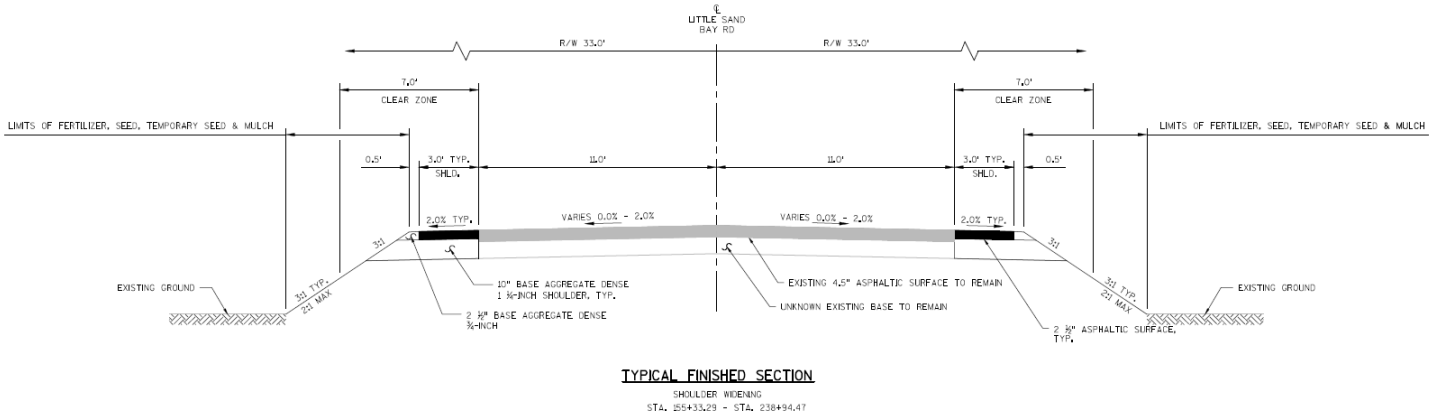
Typical Finished Section Sta. 155+33.29 - Sta. 239+06.45
